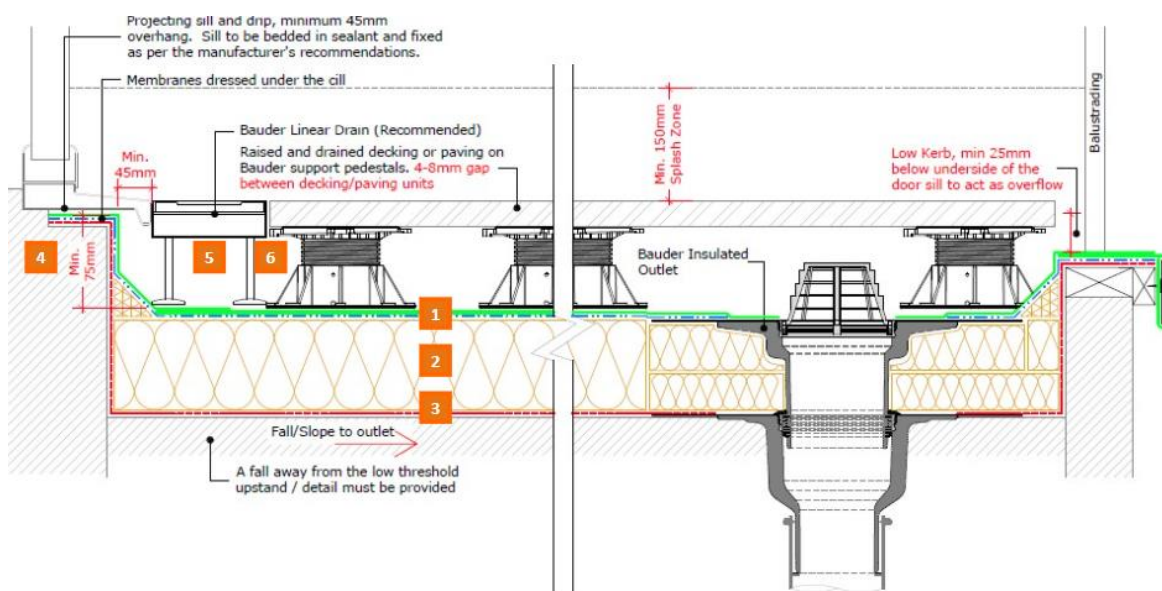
Example of drain system in inverted flat roof with paving (adopted from BAUDER 2018)
